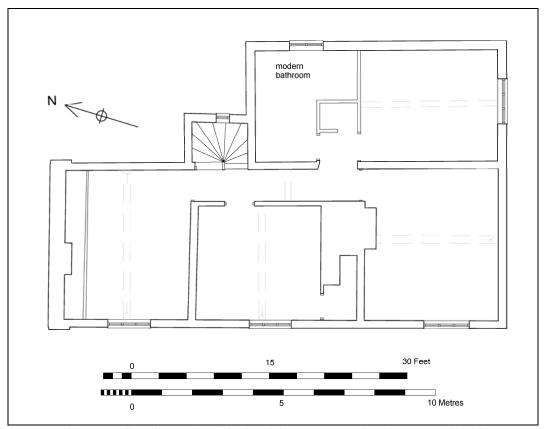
Hill Farm, first floor plan (derived from survey drawings supplied by Hayward Architects).
